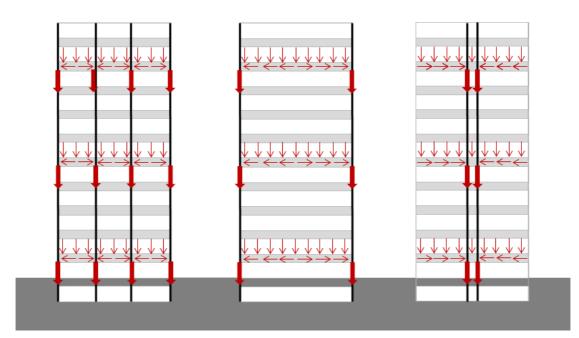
Principle sketch over straight vertical load paths in structural systems.
